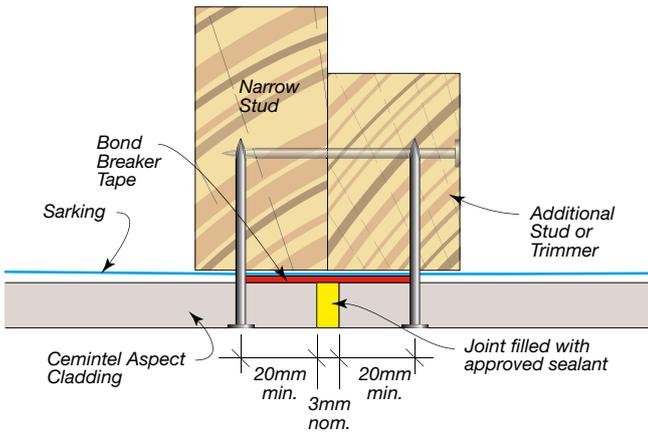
Vertical Joint with 45mm min. Timber Stud Framing – Face Fixing with Brad Nails (skewed)
